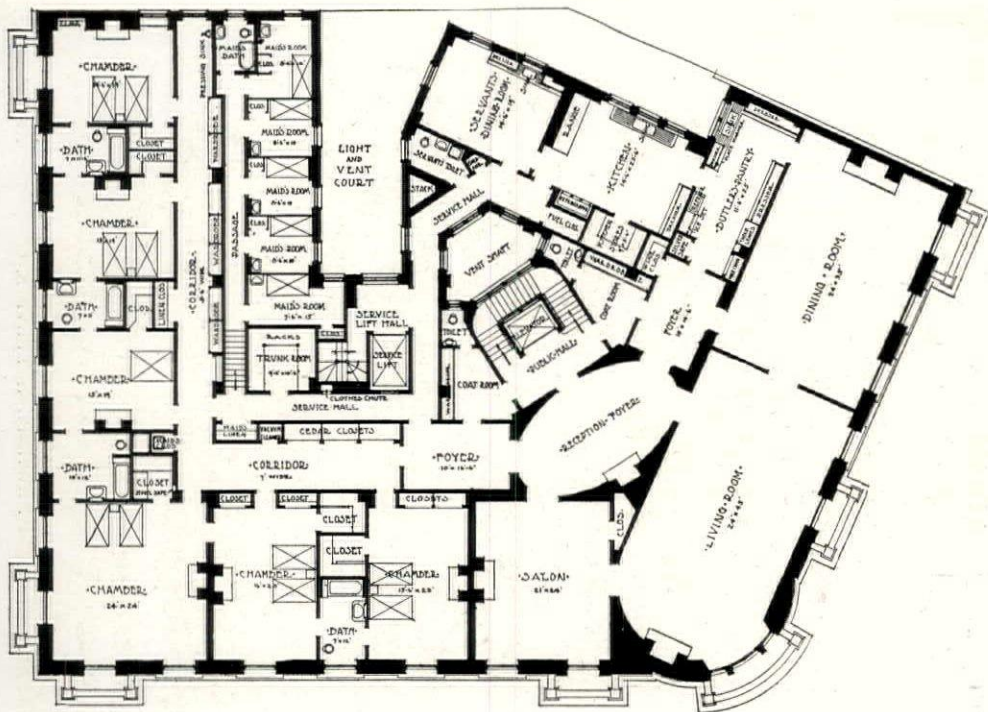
TYPICAL FLOOR PLAN—APARTMENT HOUSE AT 1785 MASSACHUSETTS AVENUE, WASHINGTON, D. C.
